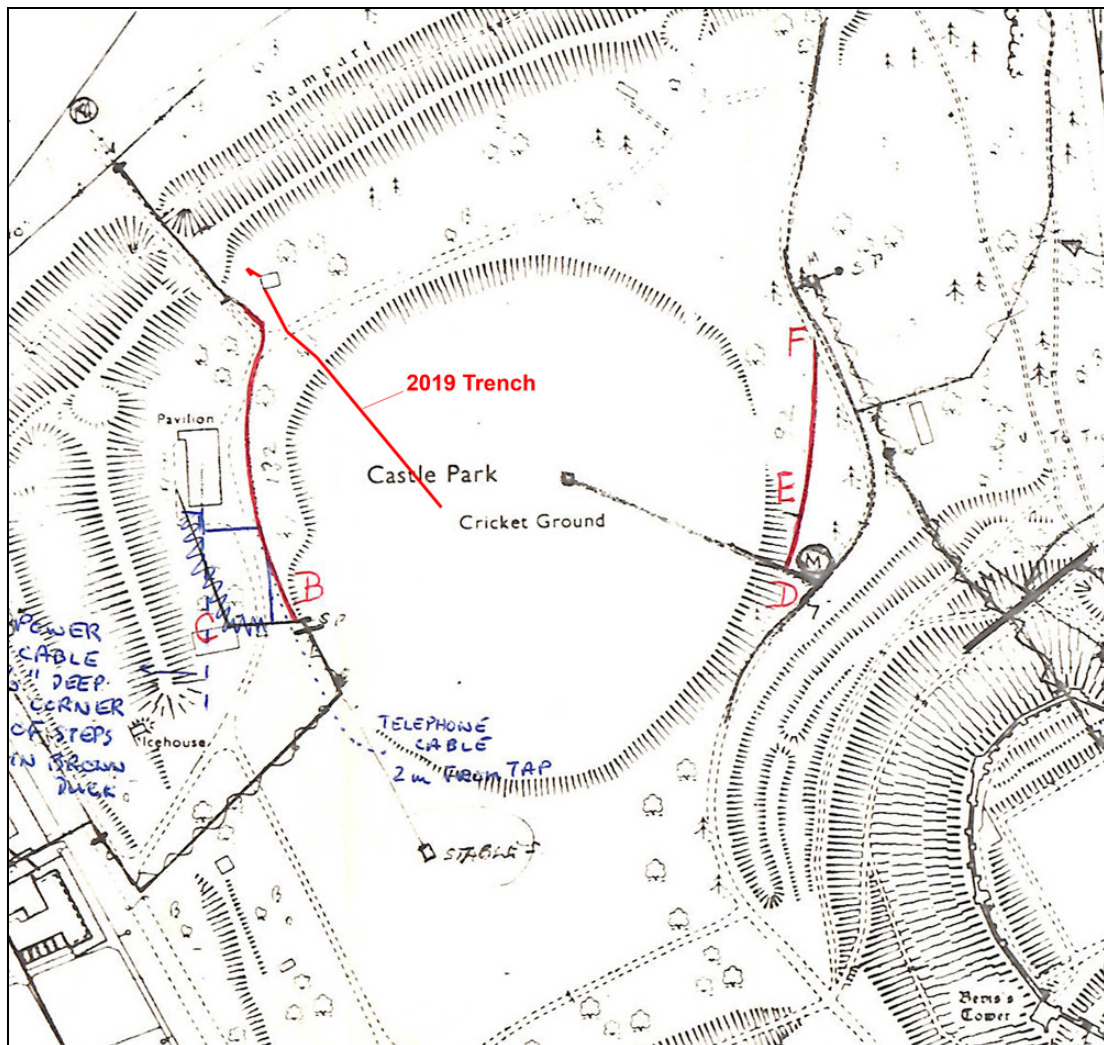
Plan showing the Cricket Ground, with the 2019 water pipe trench marked in red
